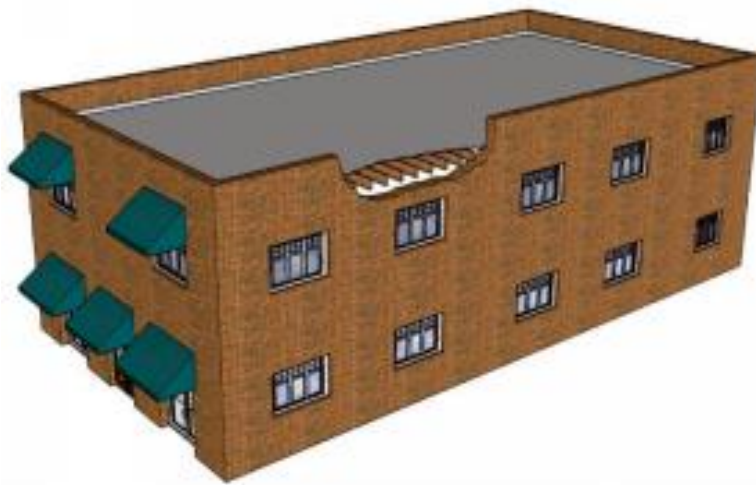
Isometric view showing example building with perimeter URM bearing walls, URM parapets, and wood frame roof and floor diaphragms with south wall at left.
